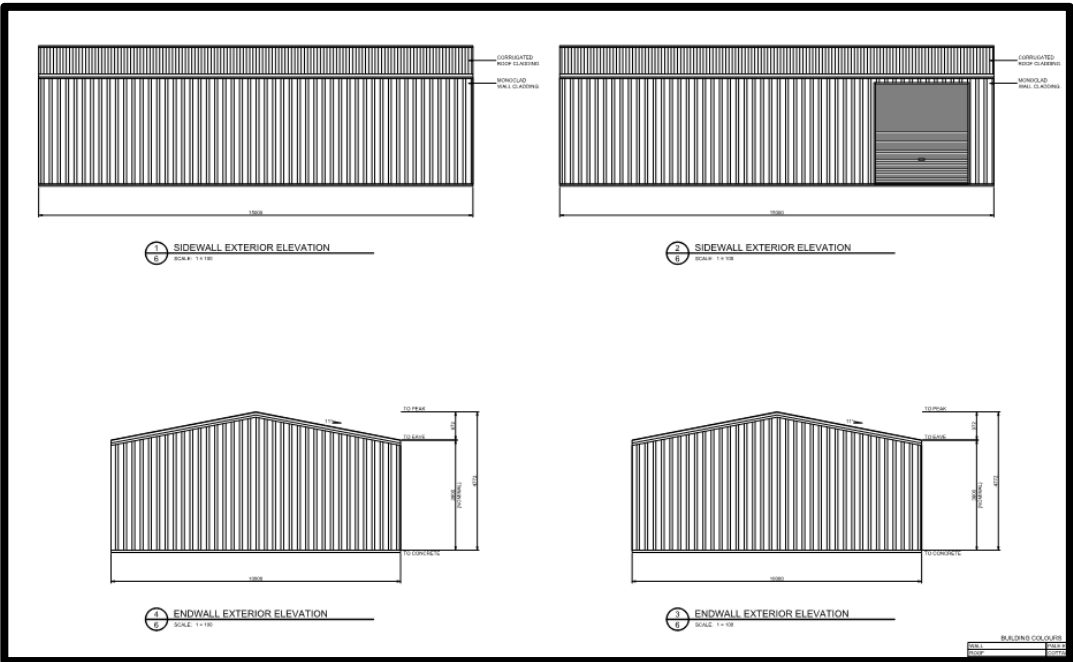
elevations of proposed buildings identified as No.4 and No.5 in Figure 2 above
